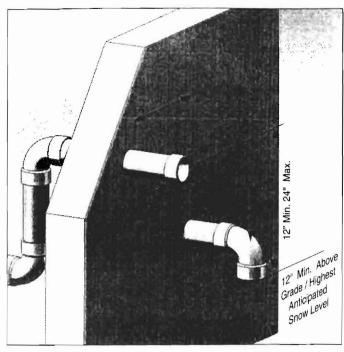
Direct Vent - Alternate Sidewall Termination of Vent and Combustion Air Piping
